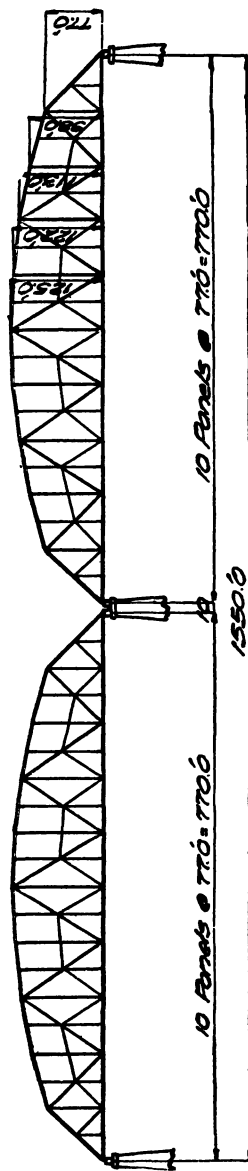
Layout of Subdivided-Triangular-Truss, Non-Continuous Spans.
